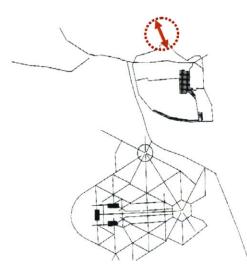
Proposed Infill plan for Railway Lines between Shahjahanabad and Sadar Bazaar Source: Author
